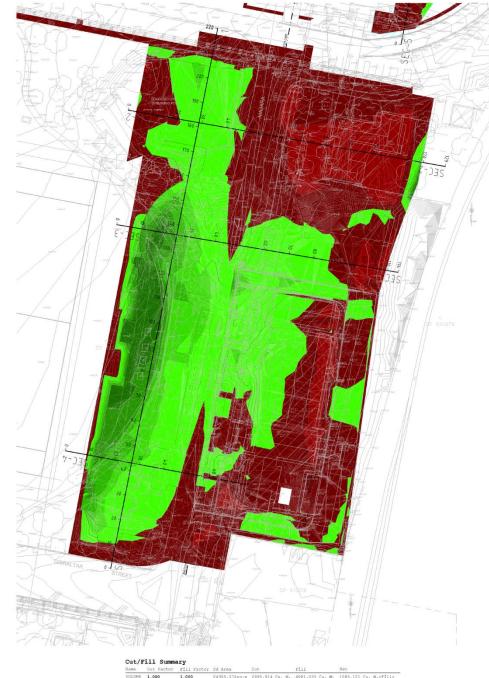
Earthworks Plan and Quantities for proposed building envelopes
